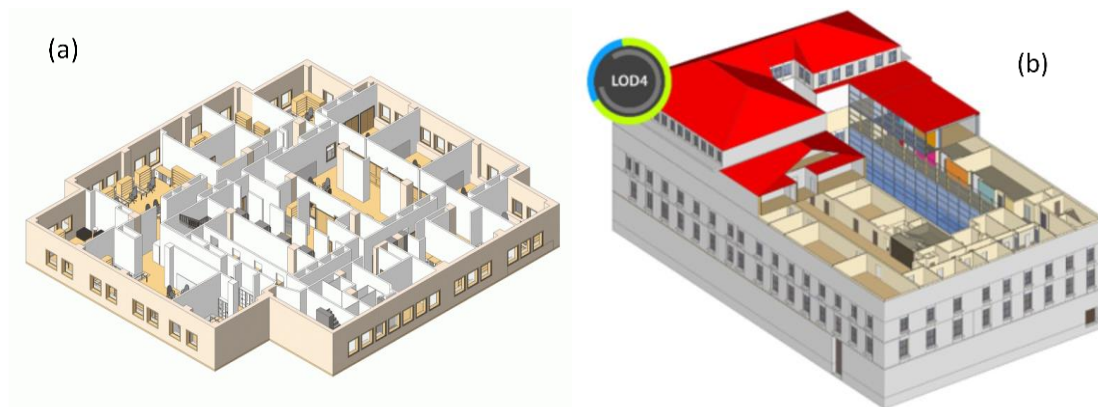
Interior room layout comparison of LOD400 (a) and LOD4 (b) from "Marvelous Design Revit House Plans..." (2018) and "About Level of Details" (2016), respectively
